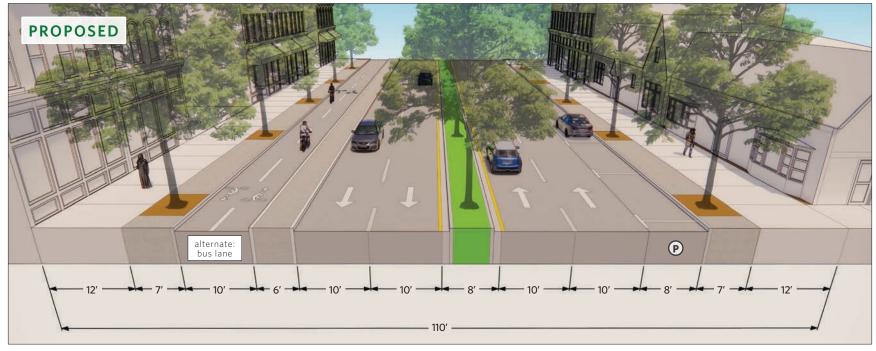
Proposed Street Section for W. Michigan Avenue between Academy and South Streets, Looking Northeast The cycle track to the left may adjust to a bus lane in future schemes; the Kalamazoo College masterplan indicates a bus lane here.
